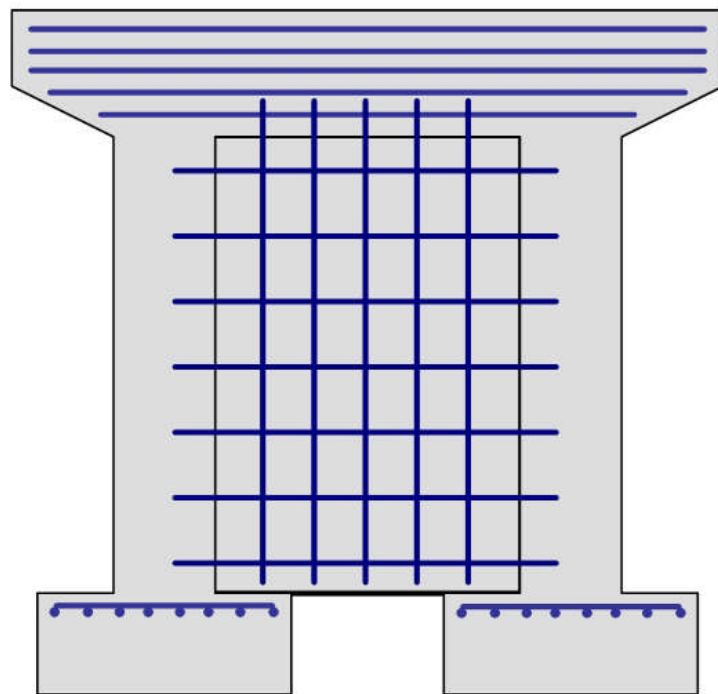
Secondary Reinforcement in Column Bent with Web Wall
